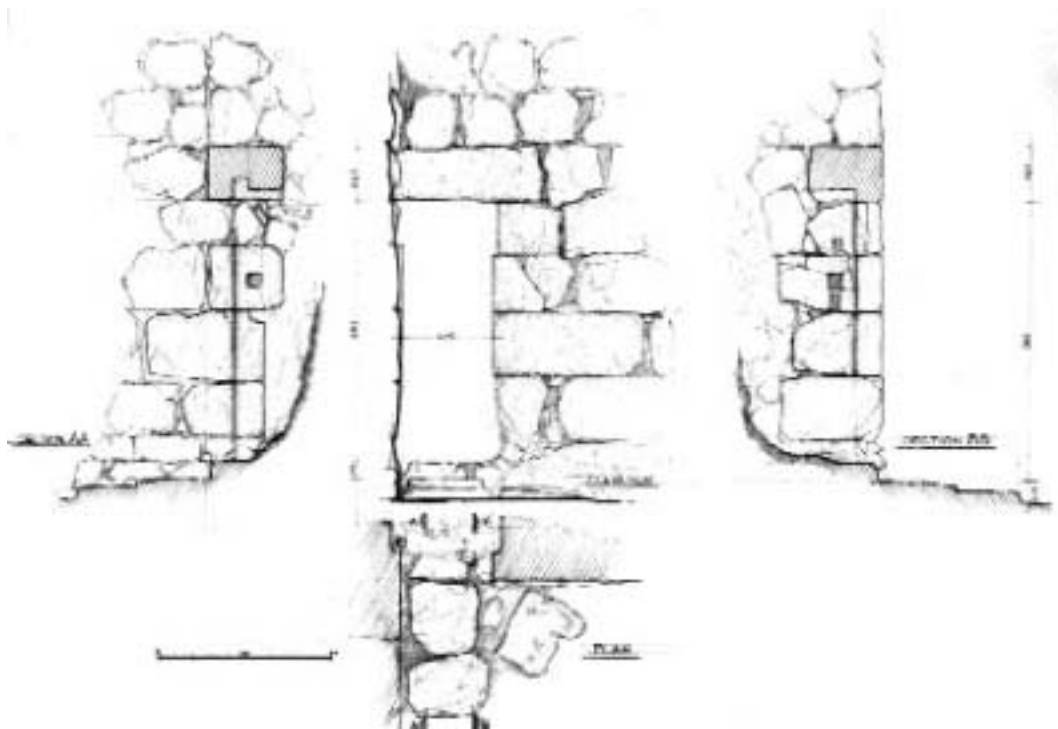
Plan, elevation and section of the city gate's postern (*drawing by V. Labianca*).
